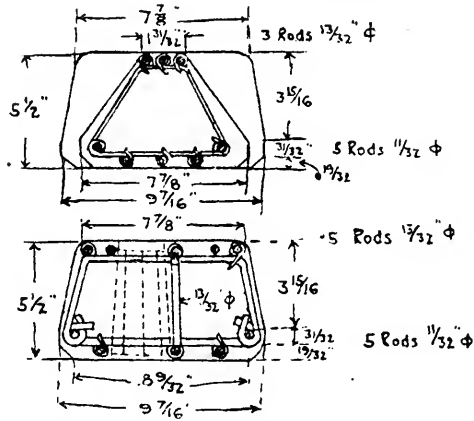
MACIACHINI REINFORCED CONCRETE TIE (TYPE V).
